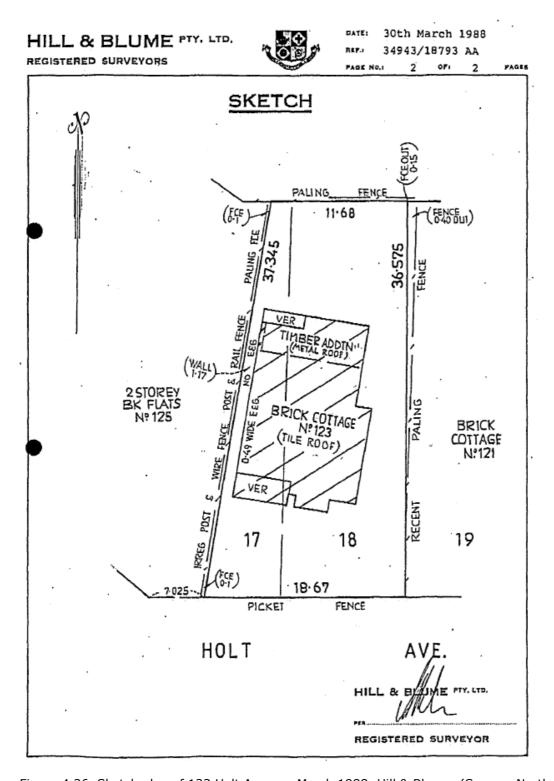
Sketch plan of 123 Holt Avenue, March 1988, Hill & Blume. (Source: North Sydney Council, P339/123/3)
